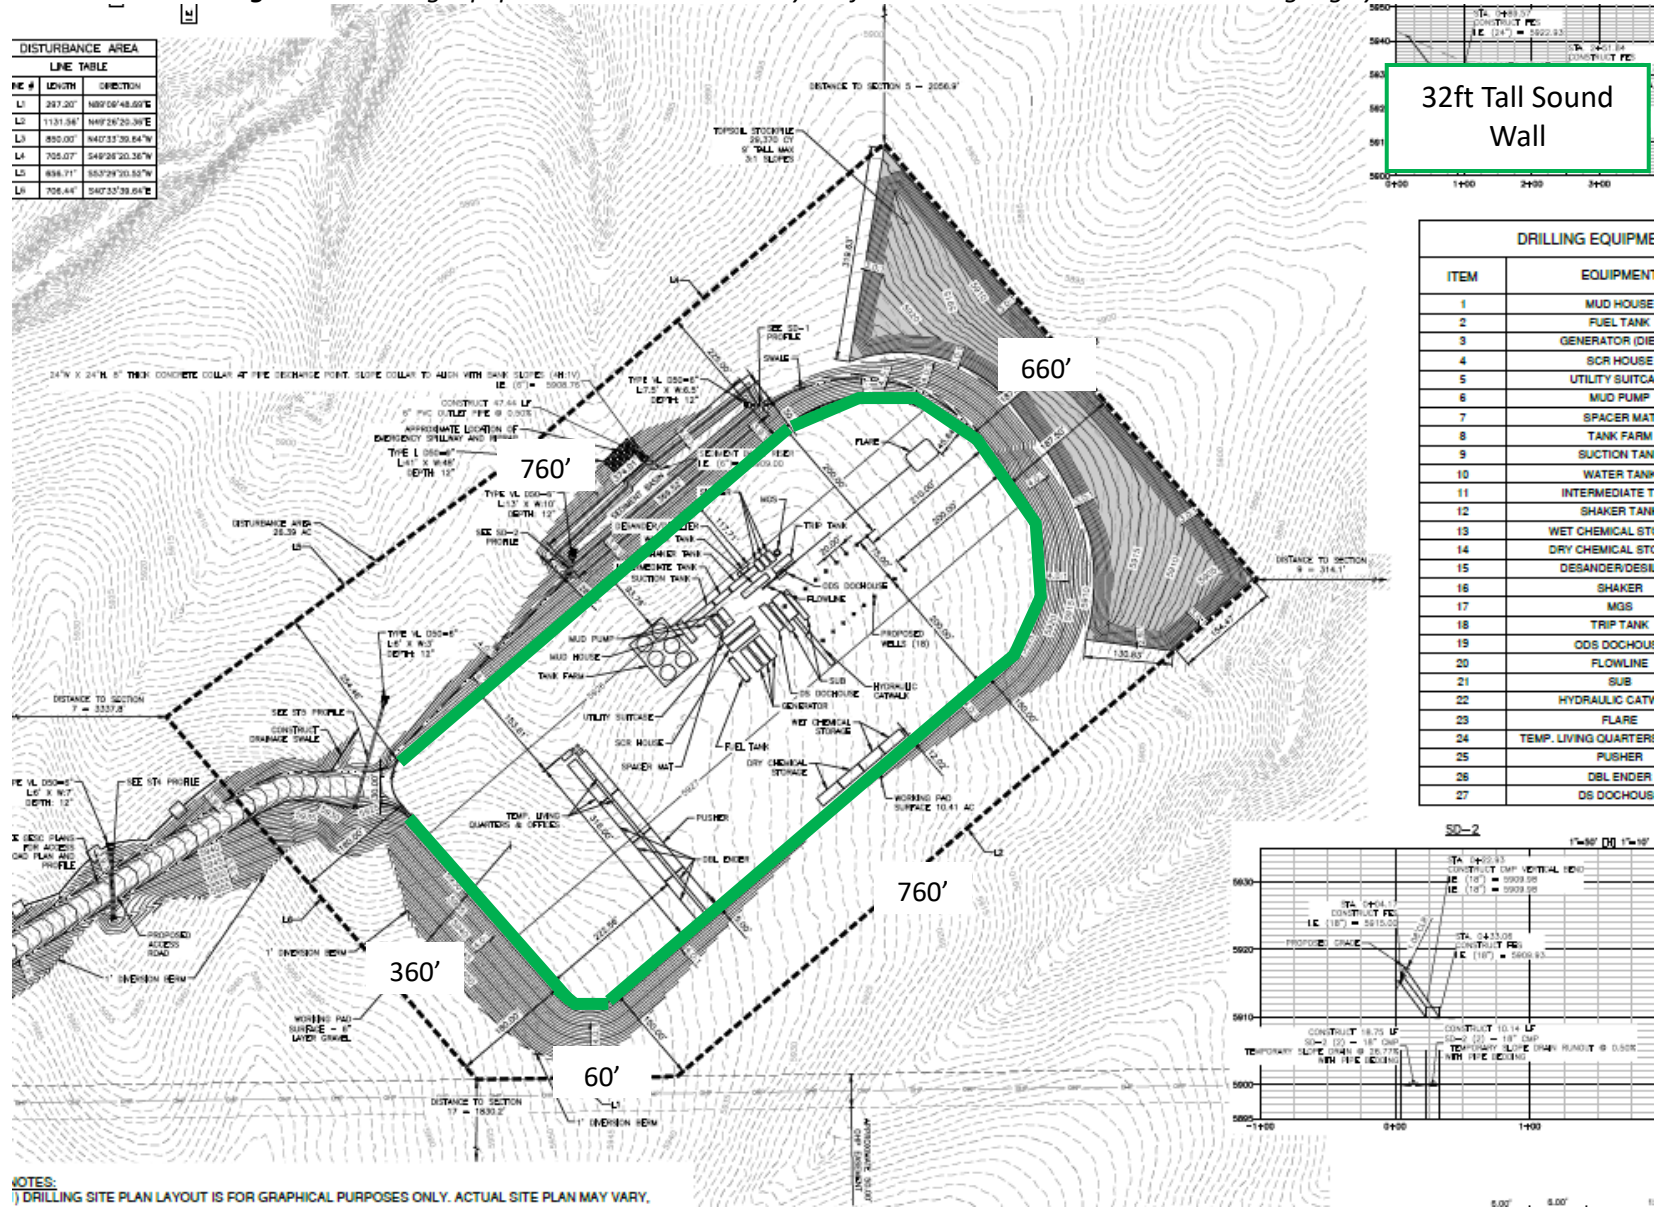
Completions Equipment and Soundwall Layout for the Liberty Quiet Fleet
